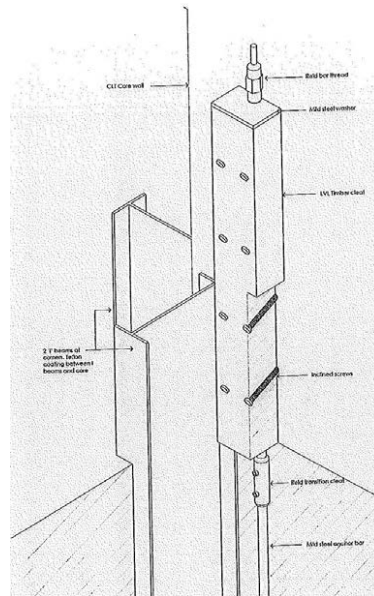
Part isometric of IPC foundation connections showing pairs of steel members at corners to prevent IPC translation, and one of the vertical hold-down bars. (Sketch is diagrammatic)
